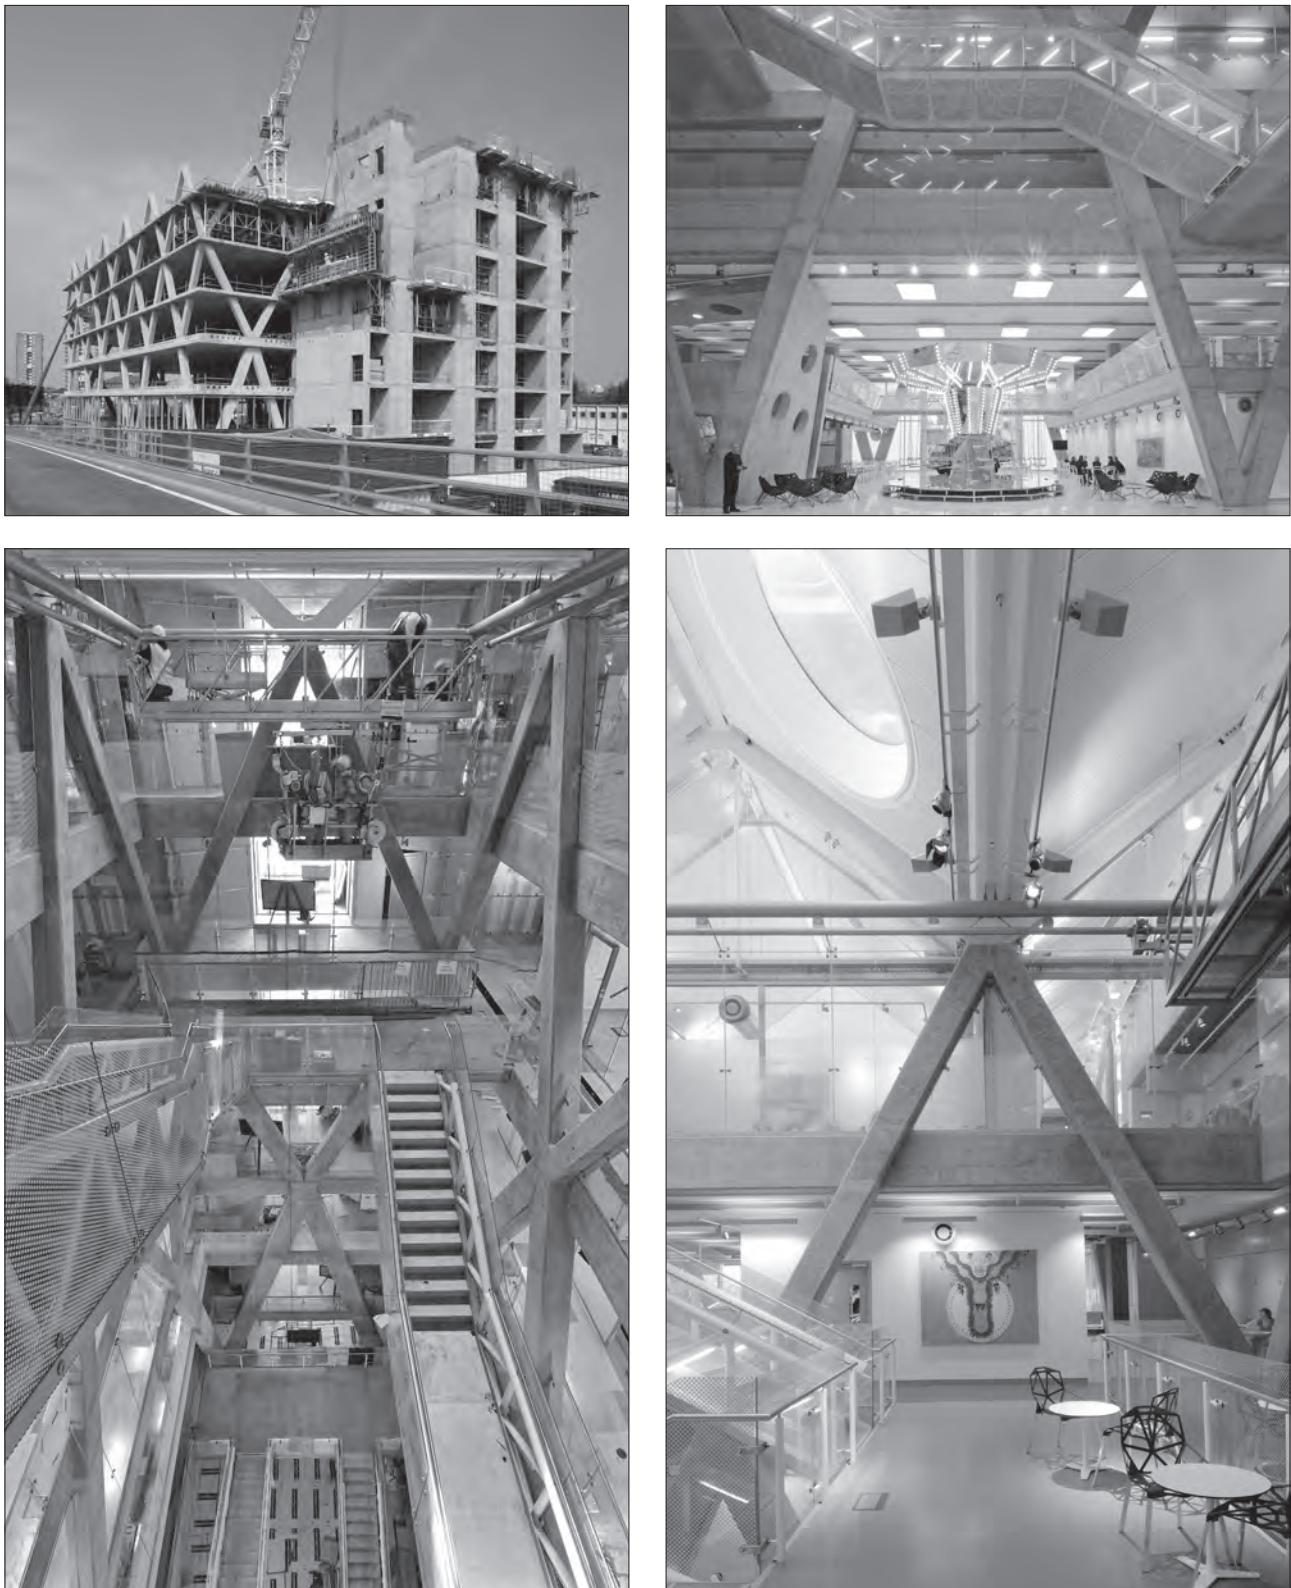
London, "Yellow Building," Allford Hall Monaghan Morris (AHMM) (structural engineers: Adams Kara Taylor), 2008; this building is part of a master plan for the development of a brown-field site. The 'Yellow Building' is coined as a 'white collar' factory for the fashion company Monsoon Accessorize that houses a gallery, garment prototyping space, and offices within one building. What is conceived here is mass-produced in factories in many other parts of the world.
